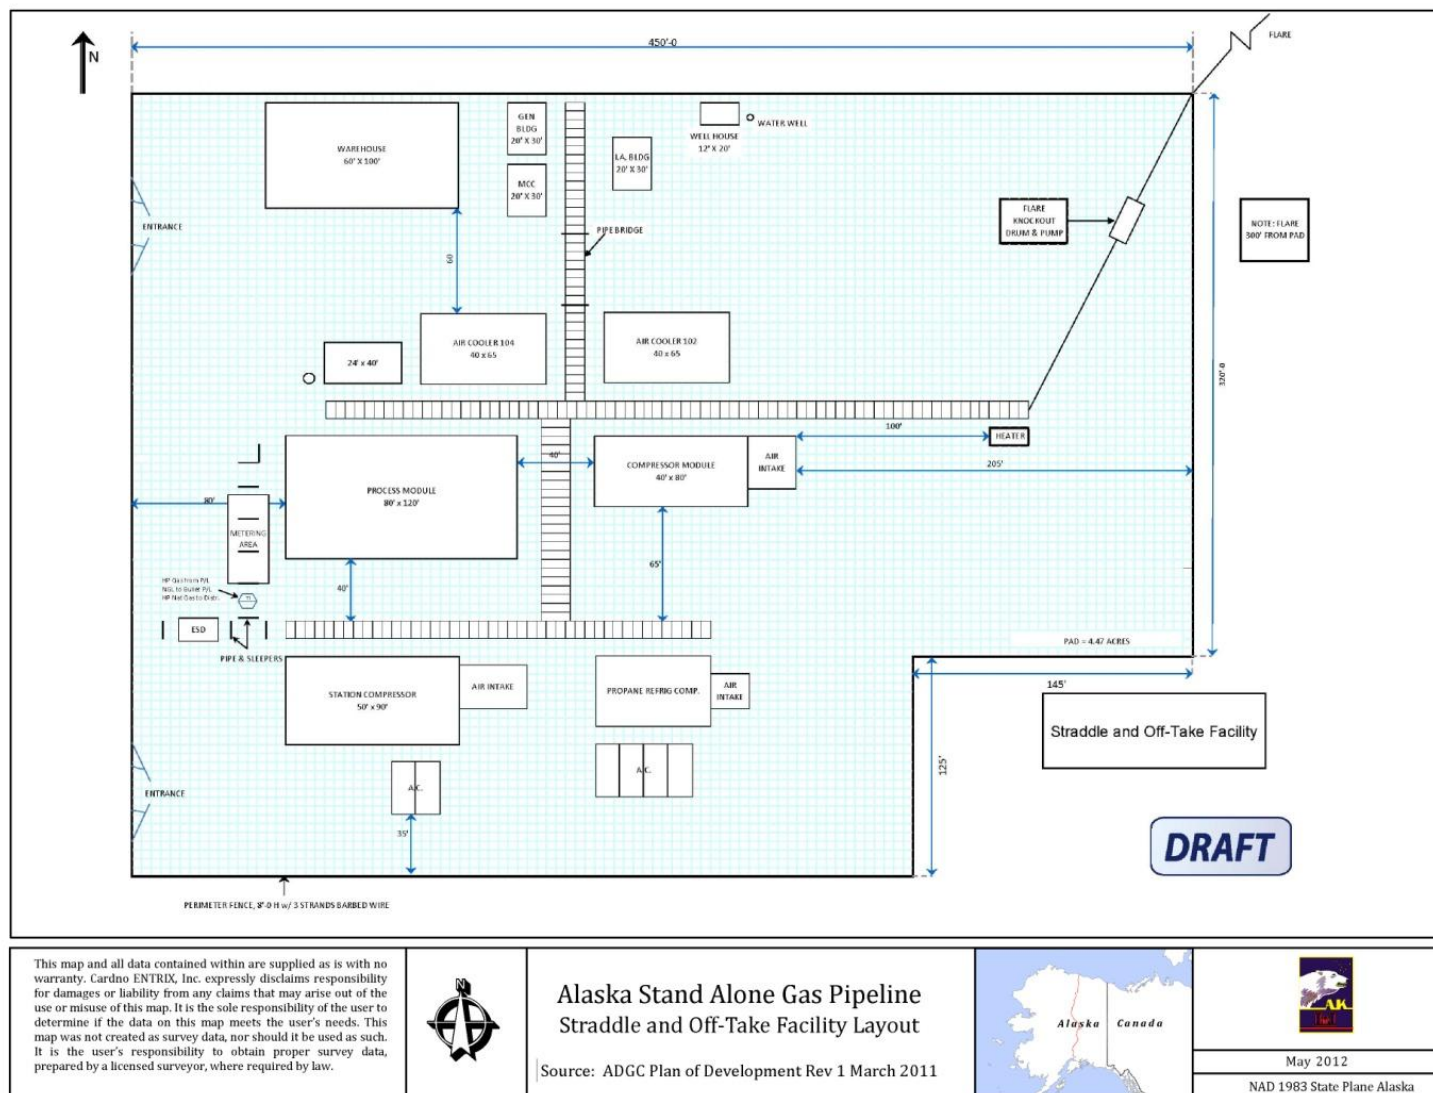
Typical Layout of Straddle and Off-Take Facility
